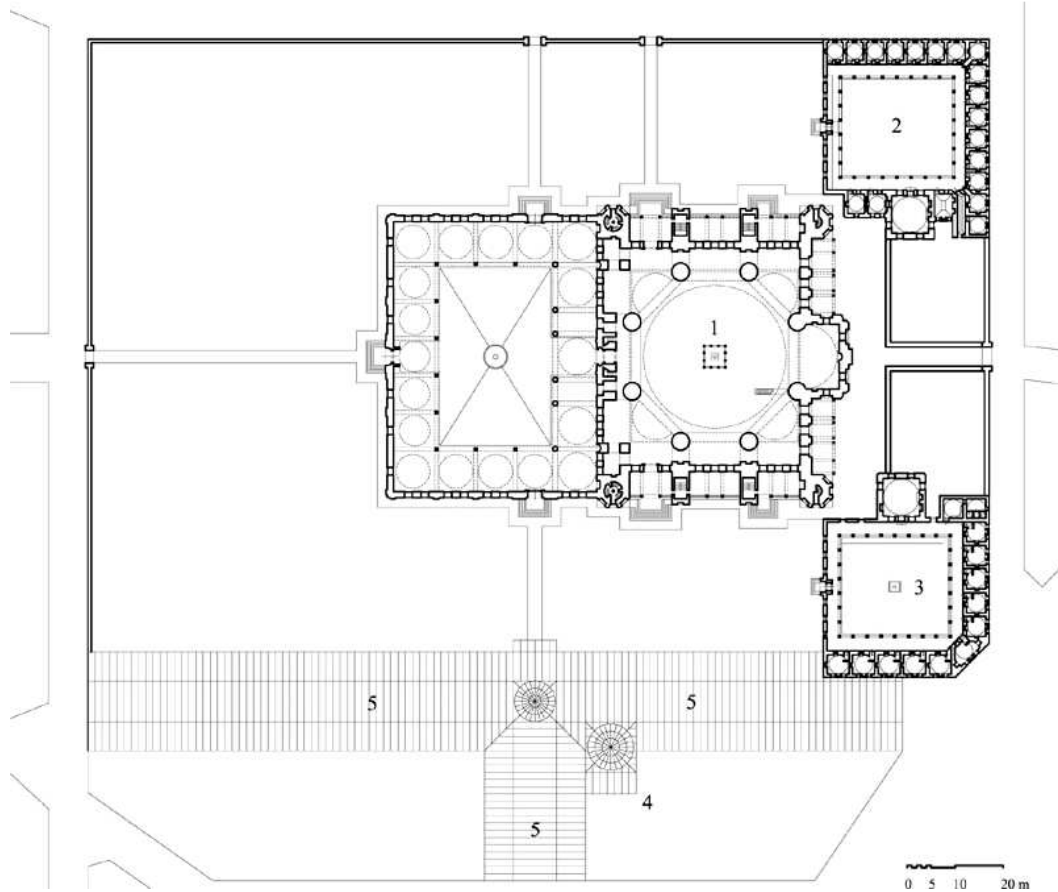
Ground floor plan of Selmiye Complex, Edirne
